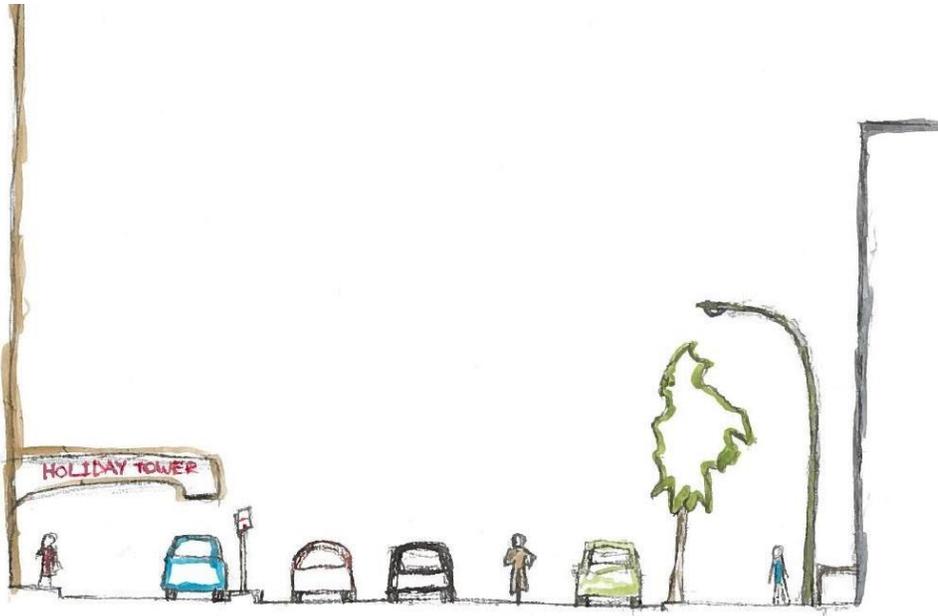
Section drawing of existing conditions of Hargrave St. in front of Holiday Tower
